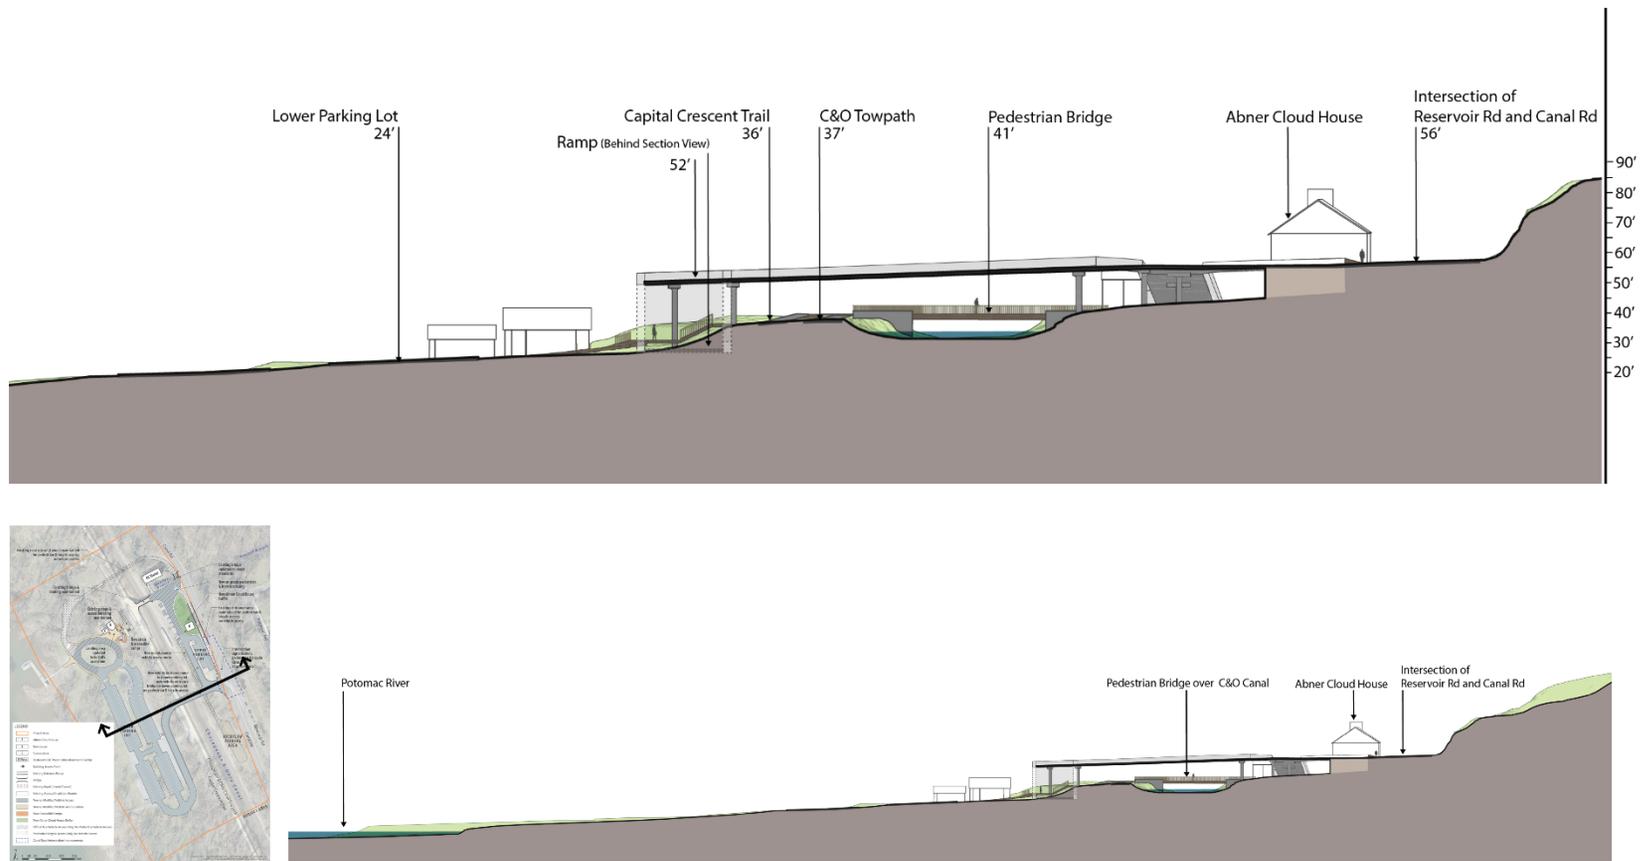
Section and Elevation of Upper and Lower Parking Lot Access Alternative (Alternative C) (detailed and full section of site)
